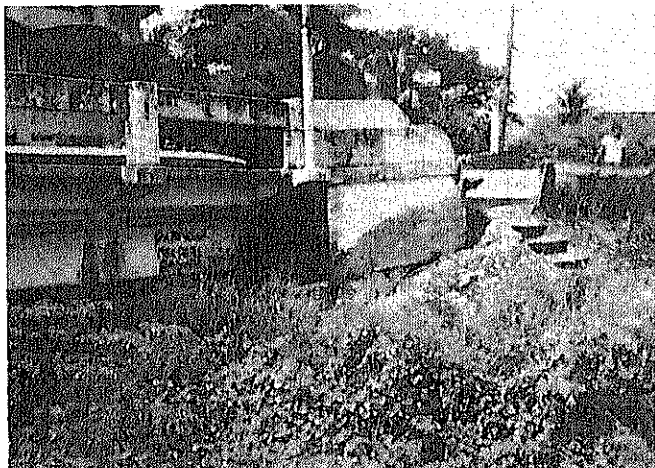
Abutment on left bank of Magsaysay Bridge
